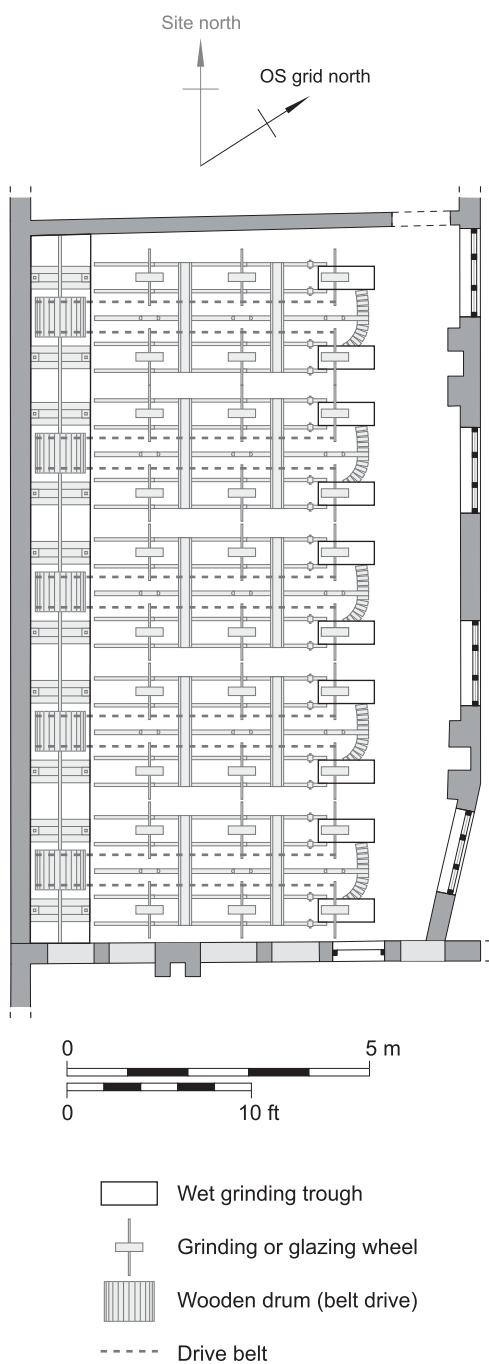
Floor plan of south grinding workshop showing operation of grinding equipment, second floor, West range
